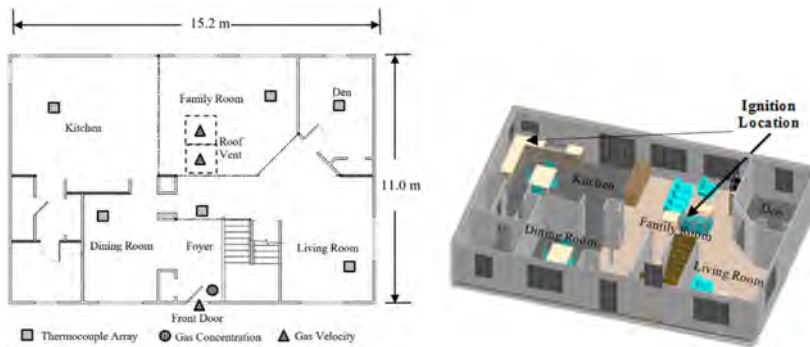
Two-story house first floor plan and 3D rendering showing furniture and ignition location.
